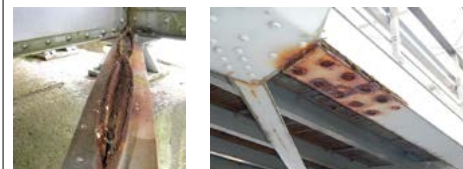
To the left: cross sectional beam with pack rust and ongoing crevice corrosion. To the right: edge beam with shot out rivet heads.
